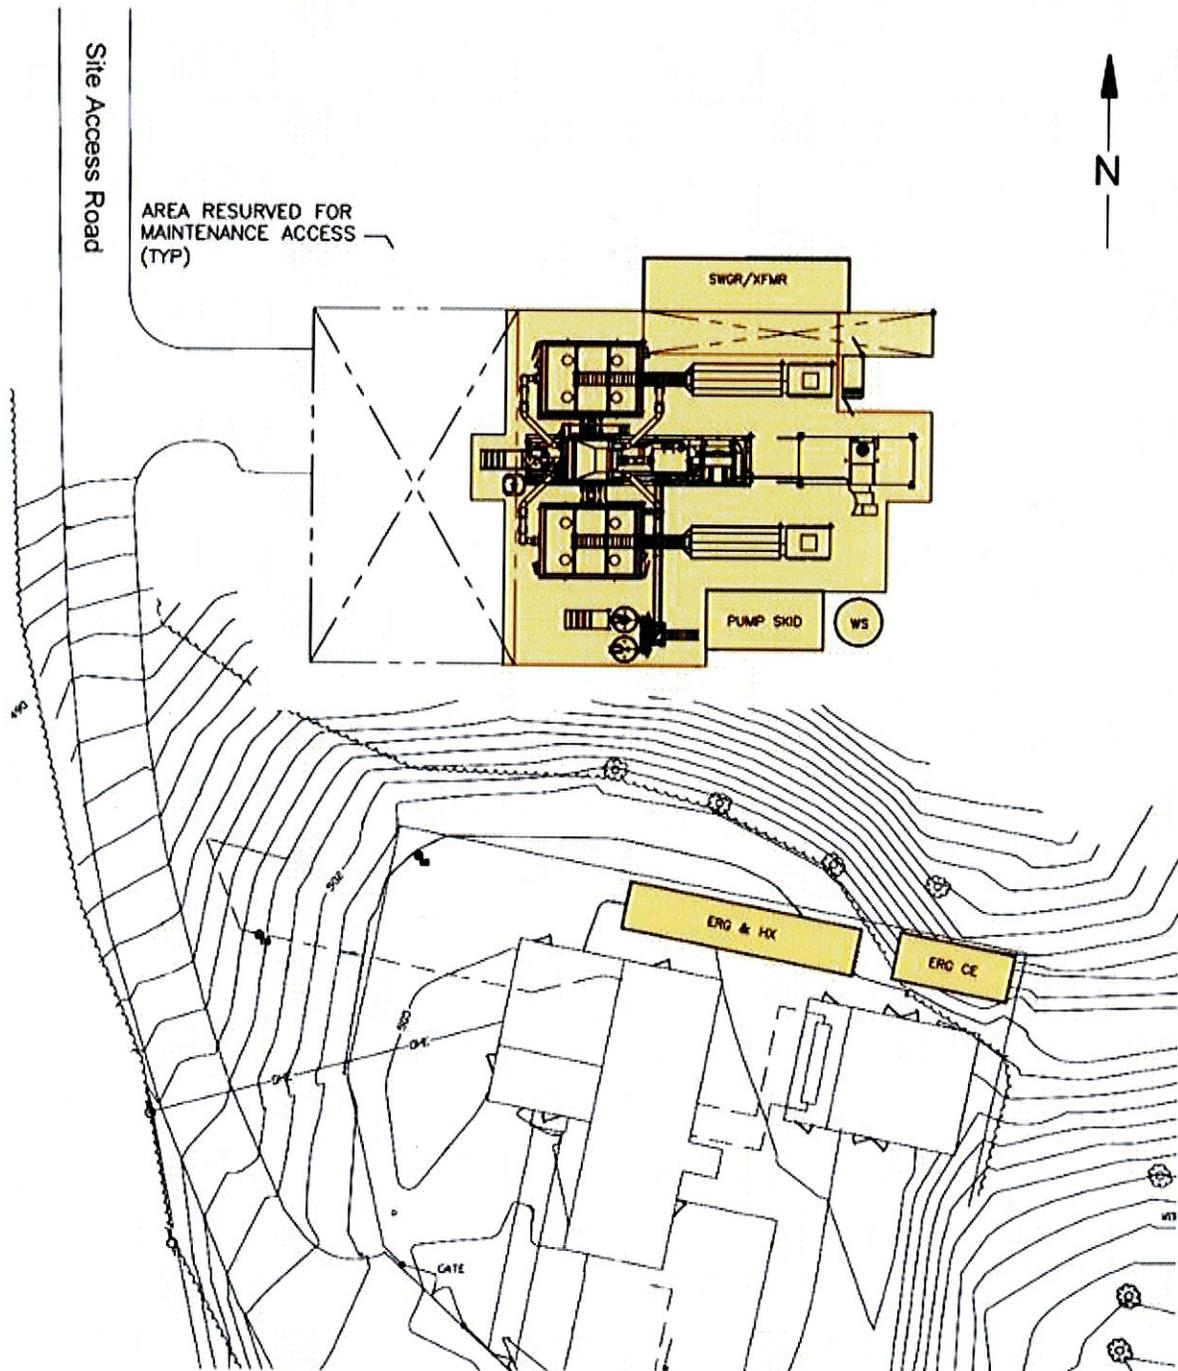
Proposed Equipment Layout of the Project highlighting the Proposed Equipment
